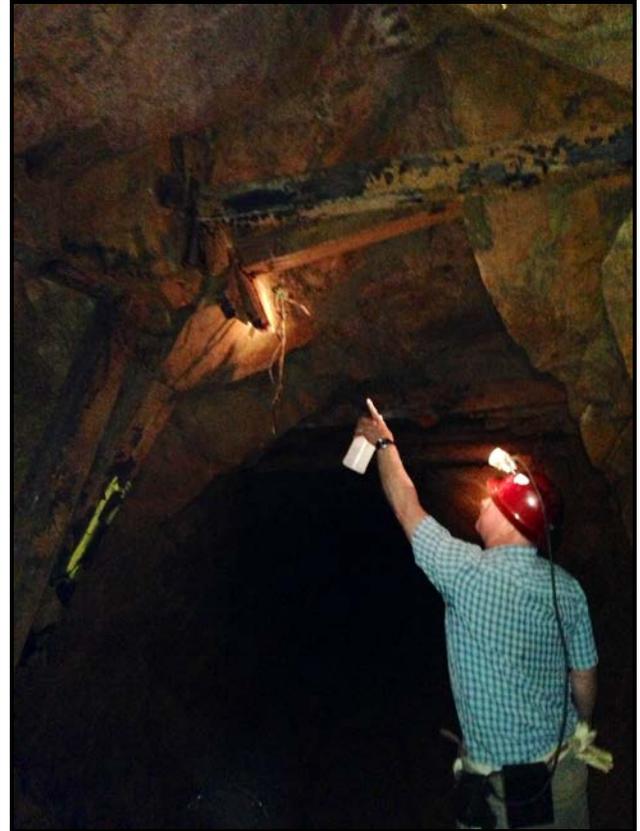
Examining a stull in the unsupported section of the 700 level adit. No scaling was necessary and no signs of recent rockfall were noted. Water seepage observed in the unsupported section was minimal.
